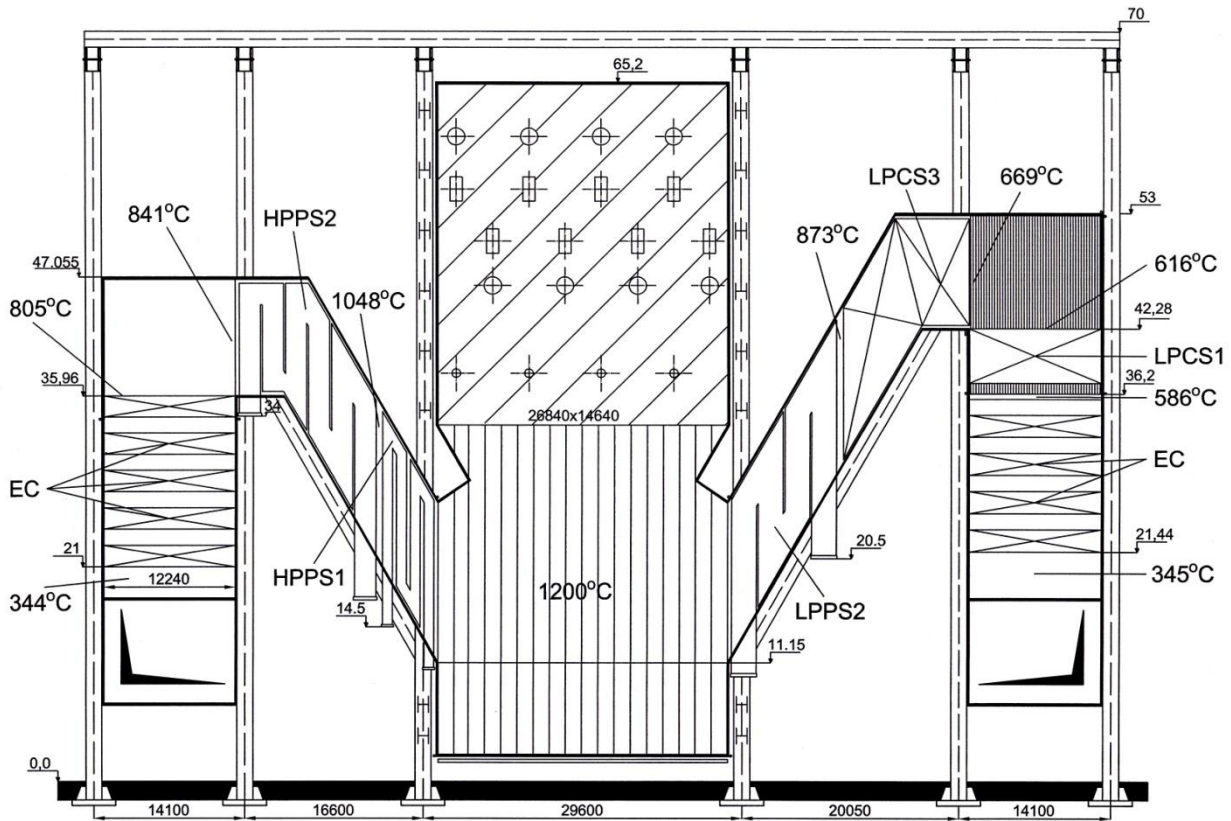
Sectional drawing of the M-shaped boiler with USCP
